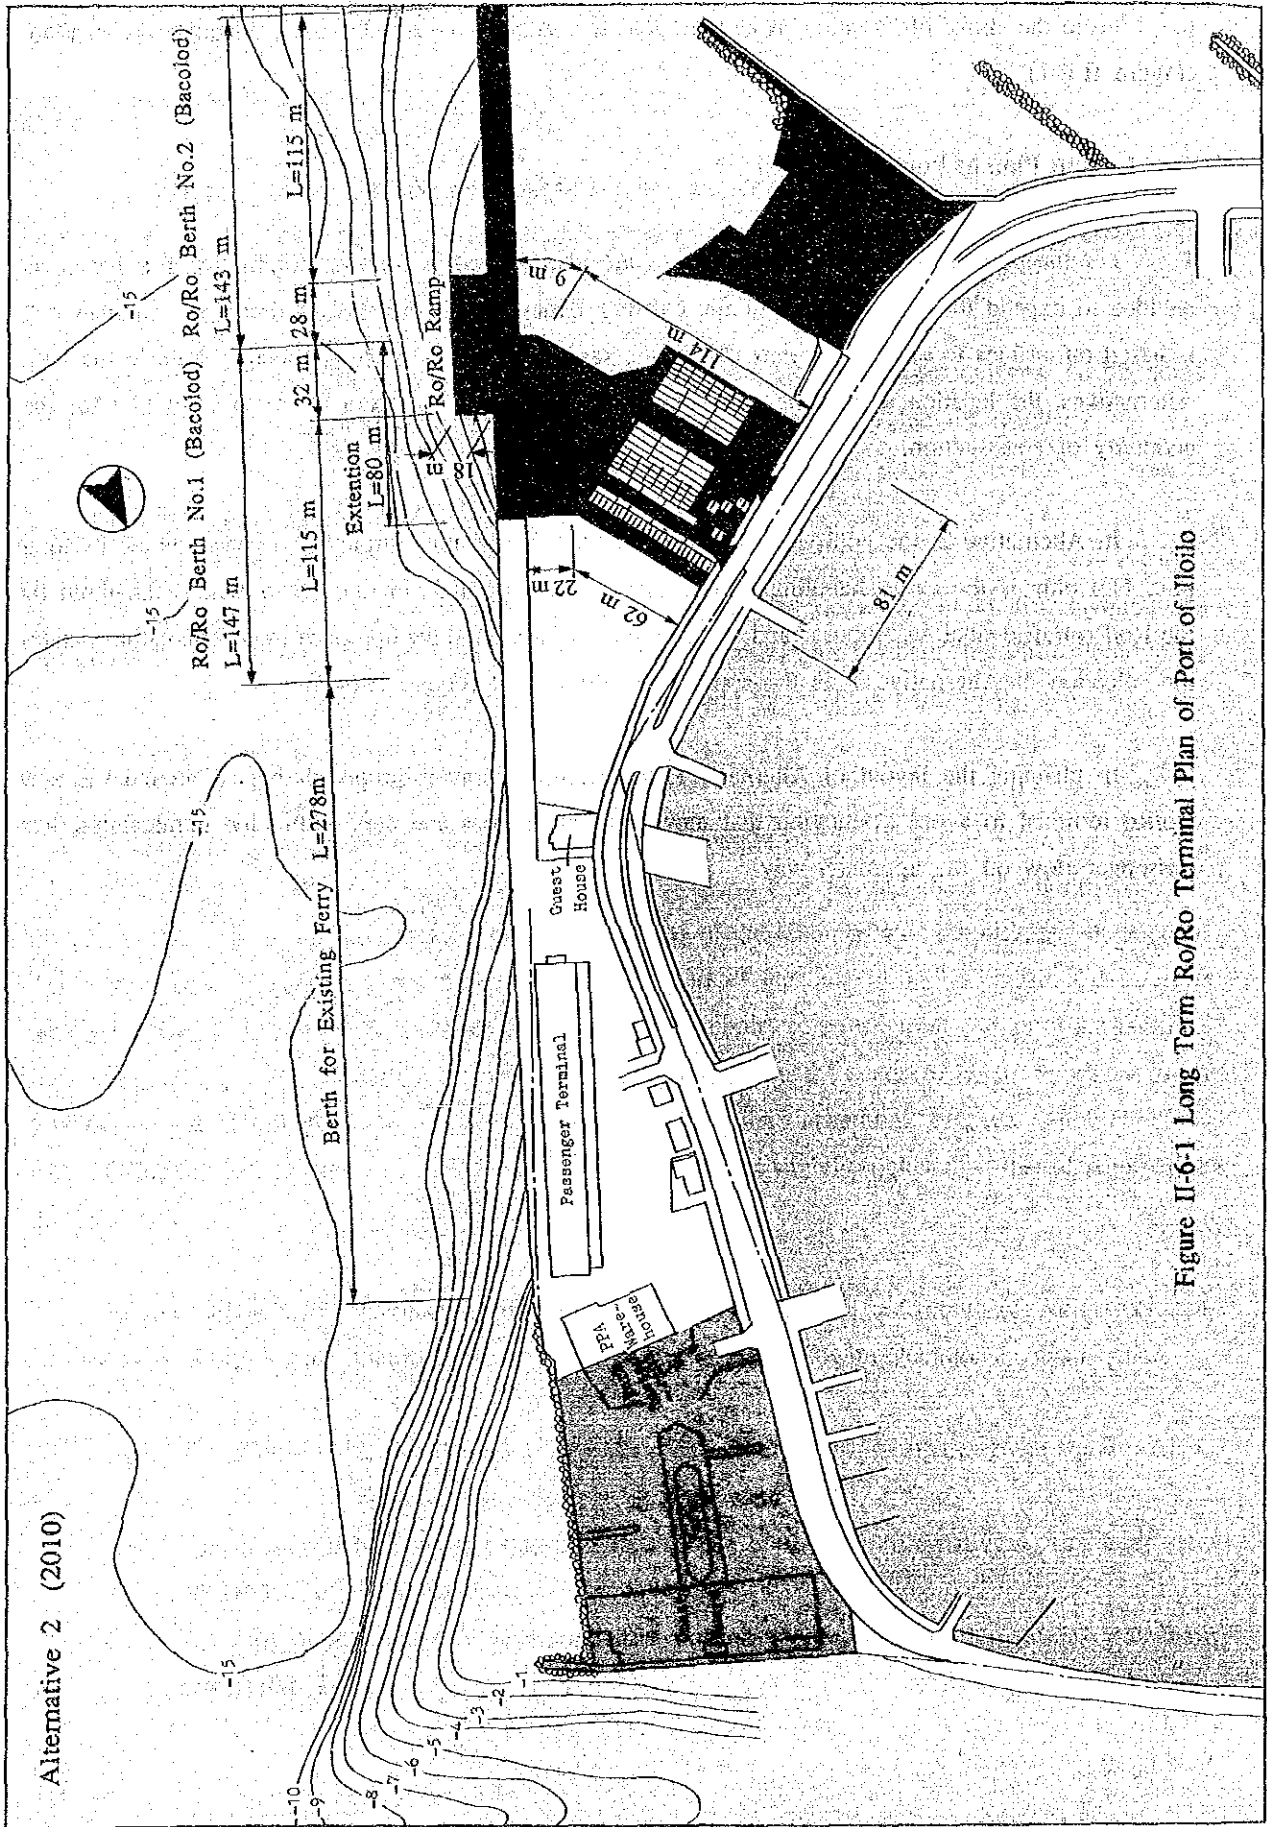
Long Term Ro/Ro Terminal Plan of Port of Iloilo
